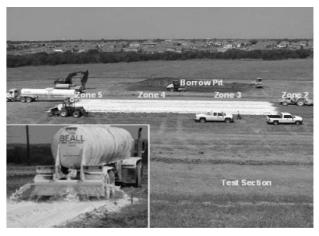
Construction of test sections (view from crest of dam) (Inset: Spreading of lime slurry).
